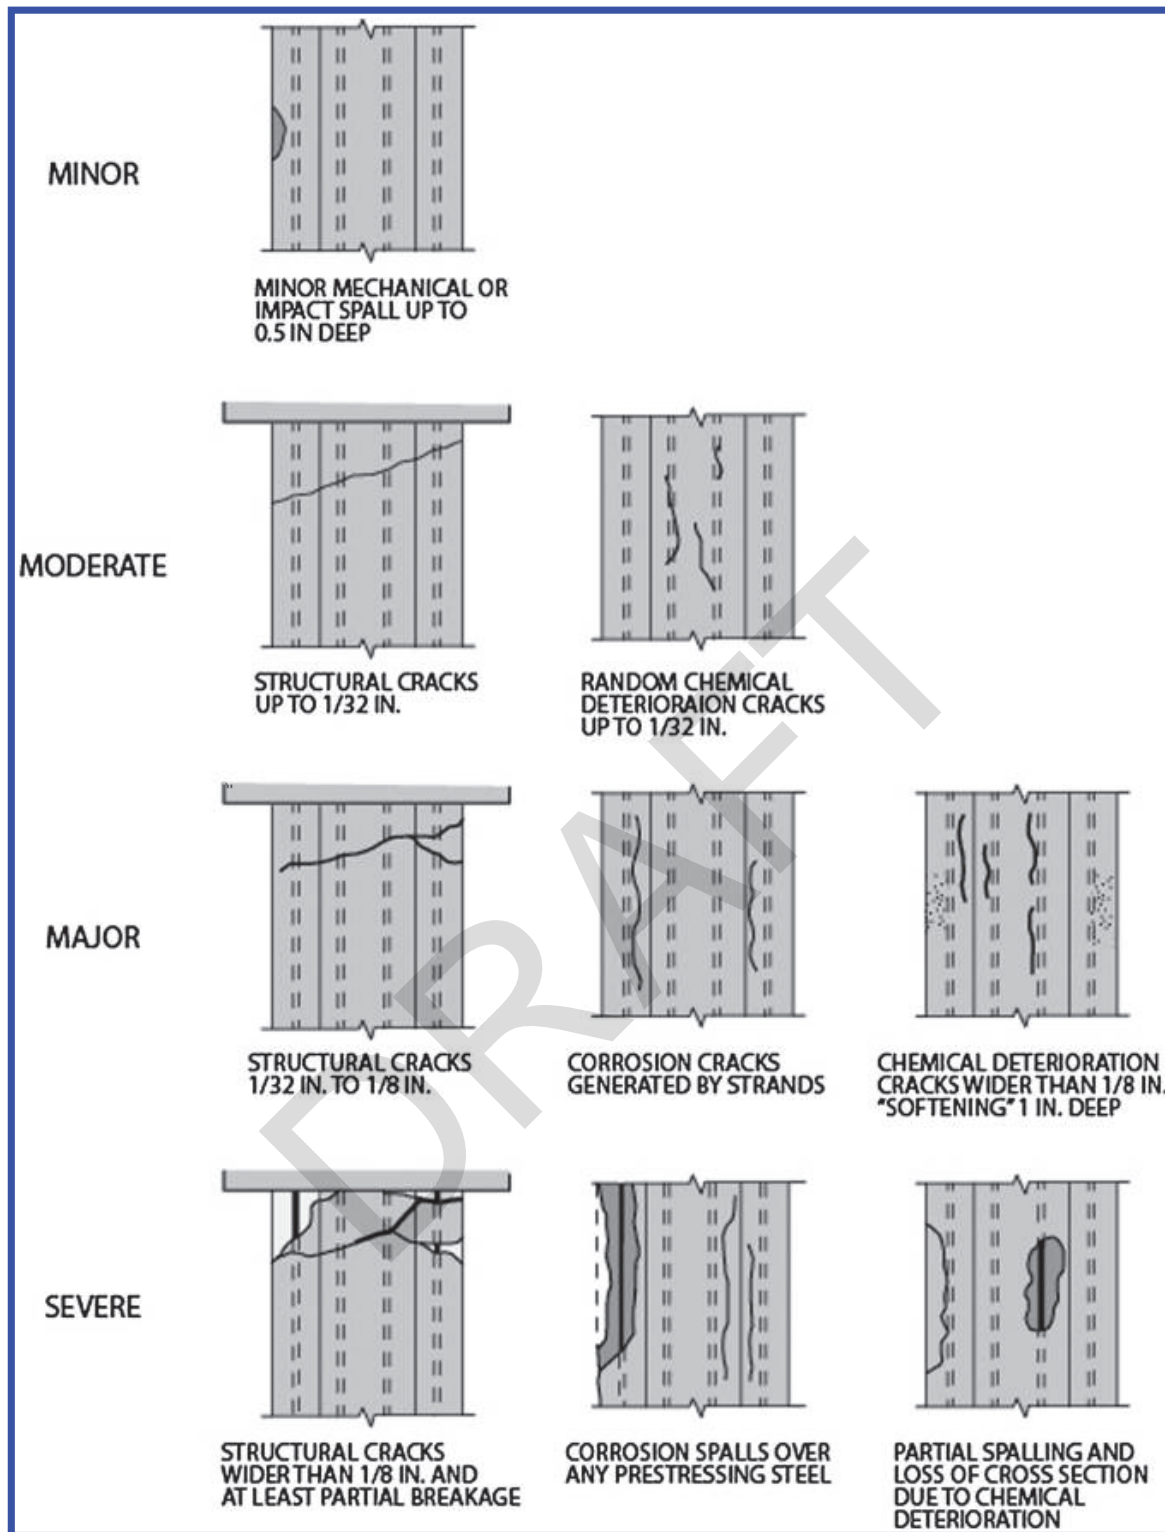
Damage ratings for prestressed concrete elements
